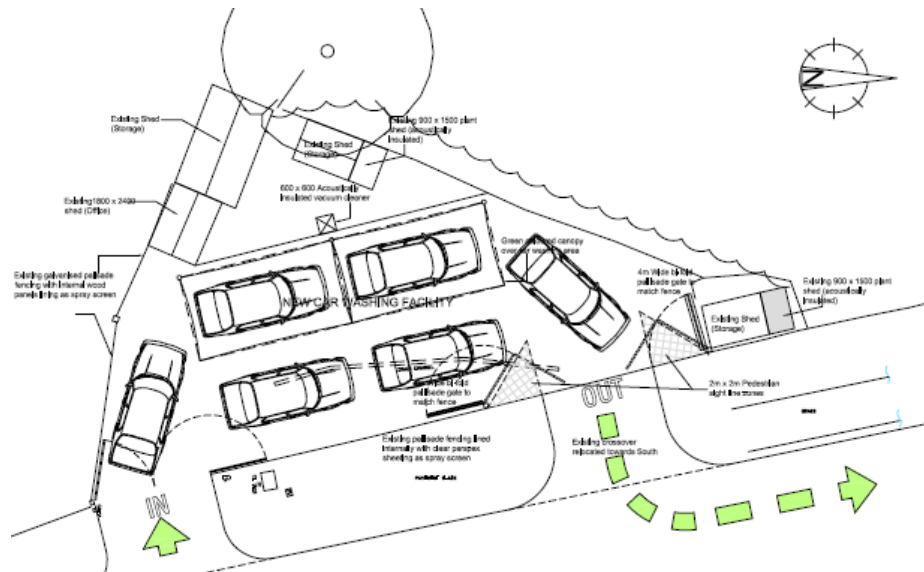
Site Plan (courtesy of David Mills Architect)
